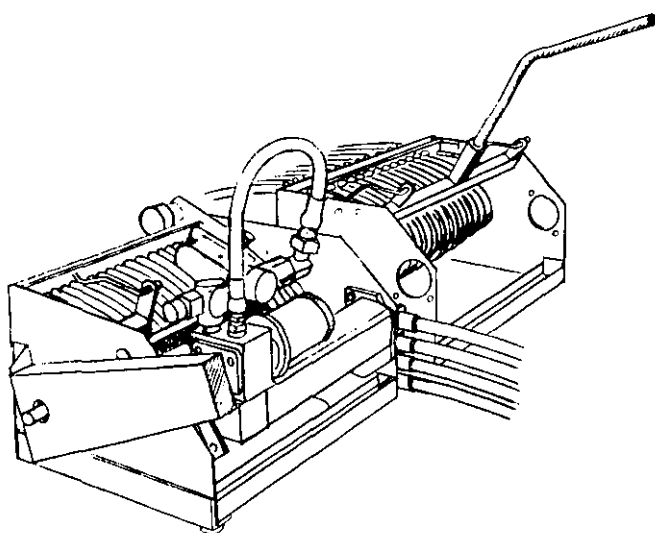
Squeeze pump with flat hoses and hydraulic drive
